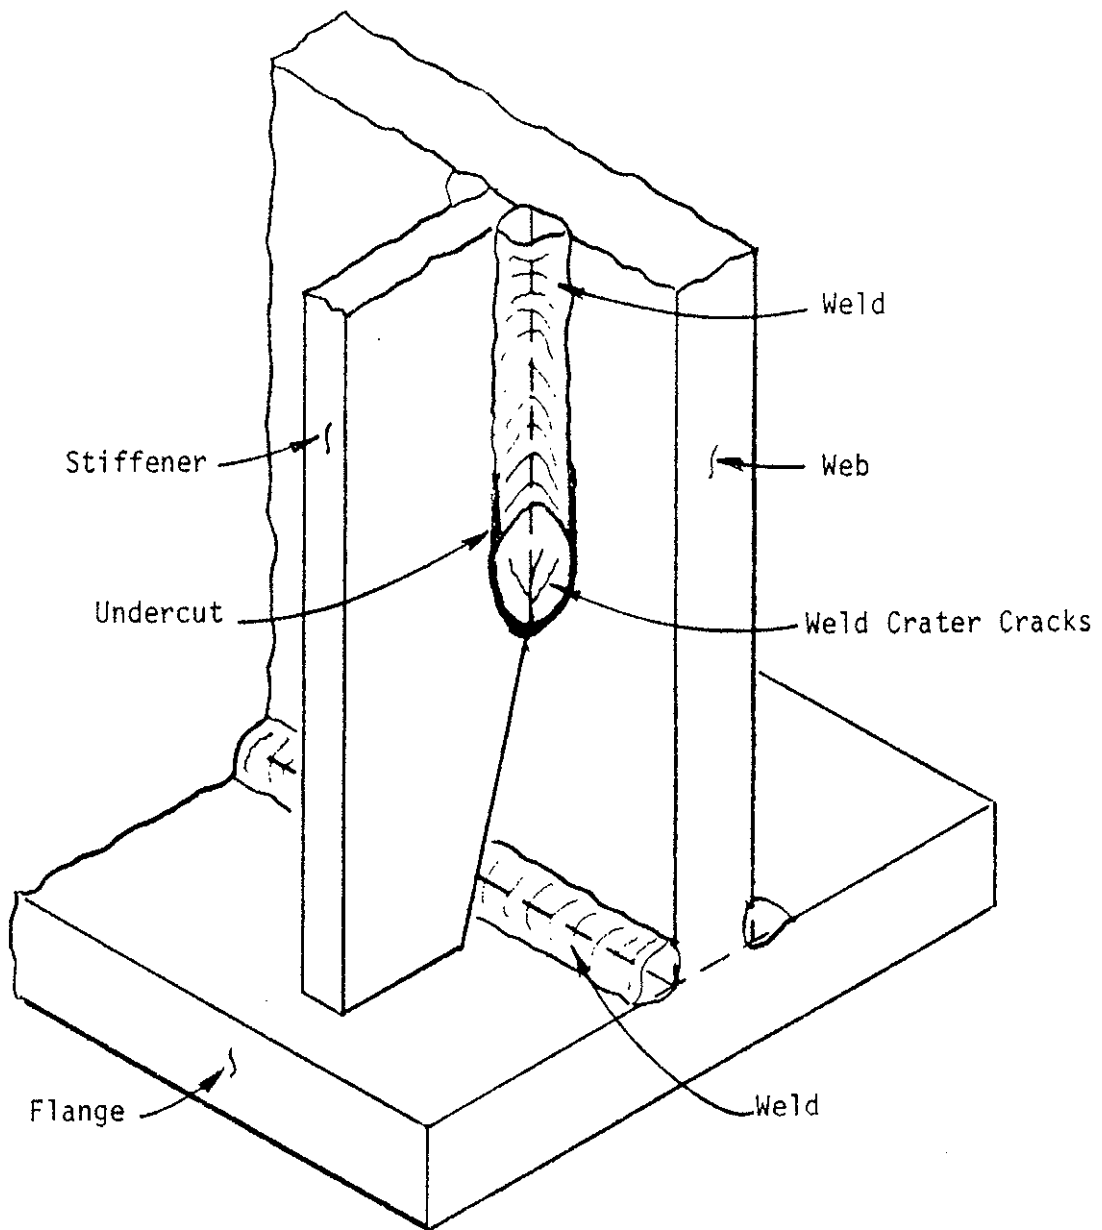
Fillet Weld Termination Below Stiffener Cope
